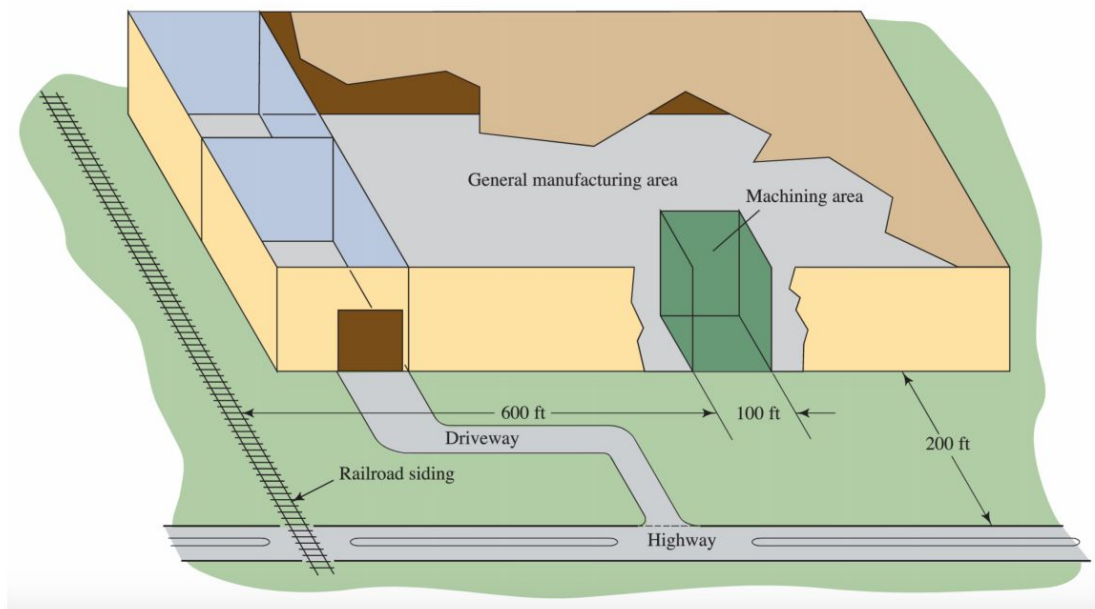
Plot plan of a hypothetical factory building for the design problem.
